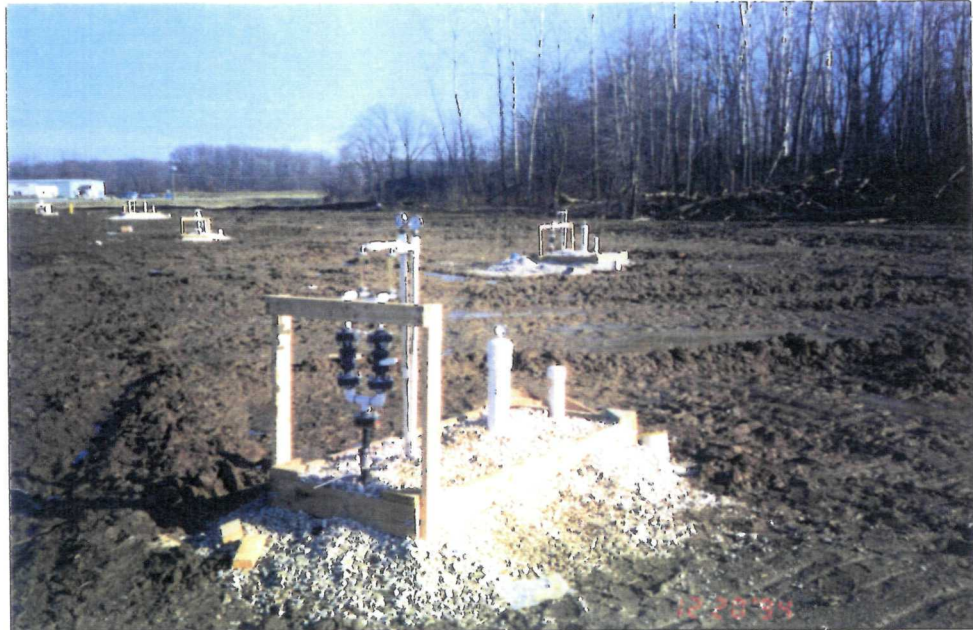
Completed soil vapor extraction / air sparging well nest (typical).
